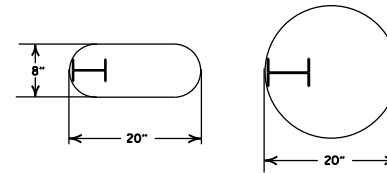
DETAIL OF GUARDRAIL PLACEMENT BEHIND CURB (W-BEAM)
